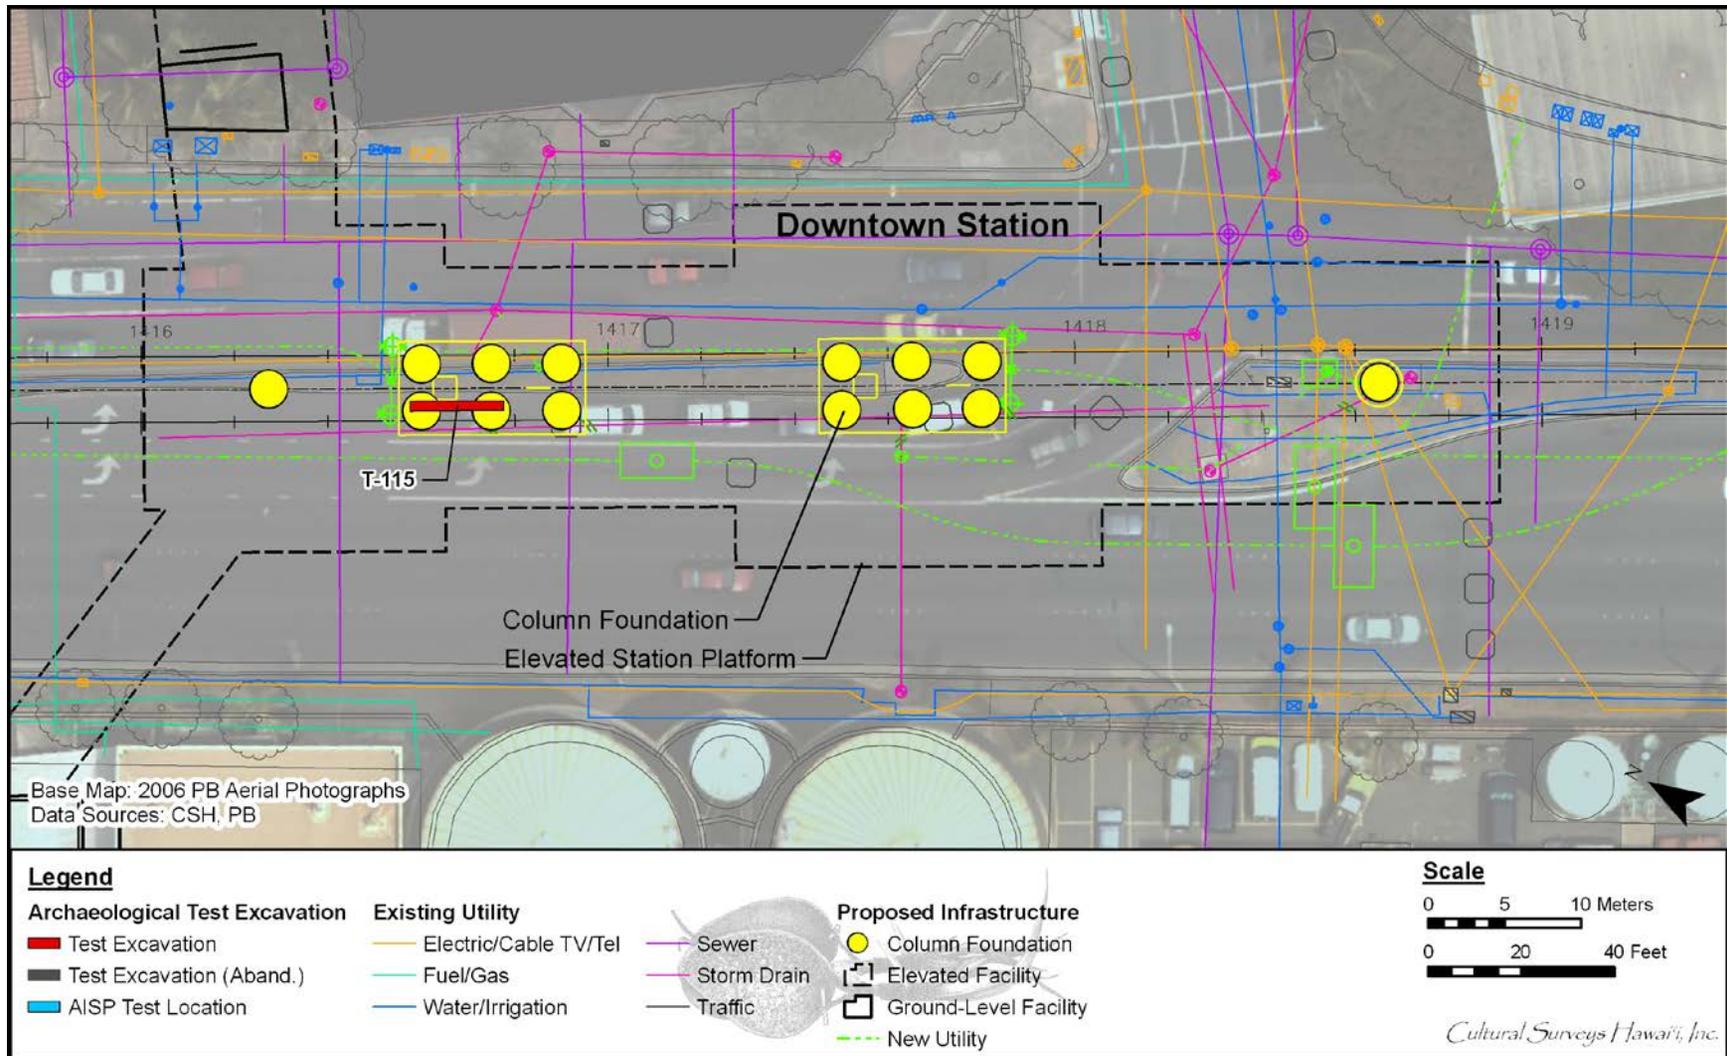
Downtown Station, detail of column foundation layout at Nimitz Highway location of actual AIS test excavations
